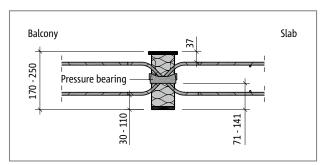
Schöck Isokorb® T type Q-E-VV5: Product section
